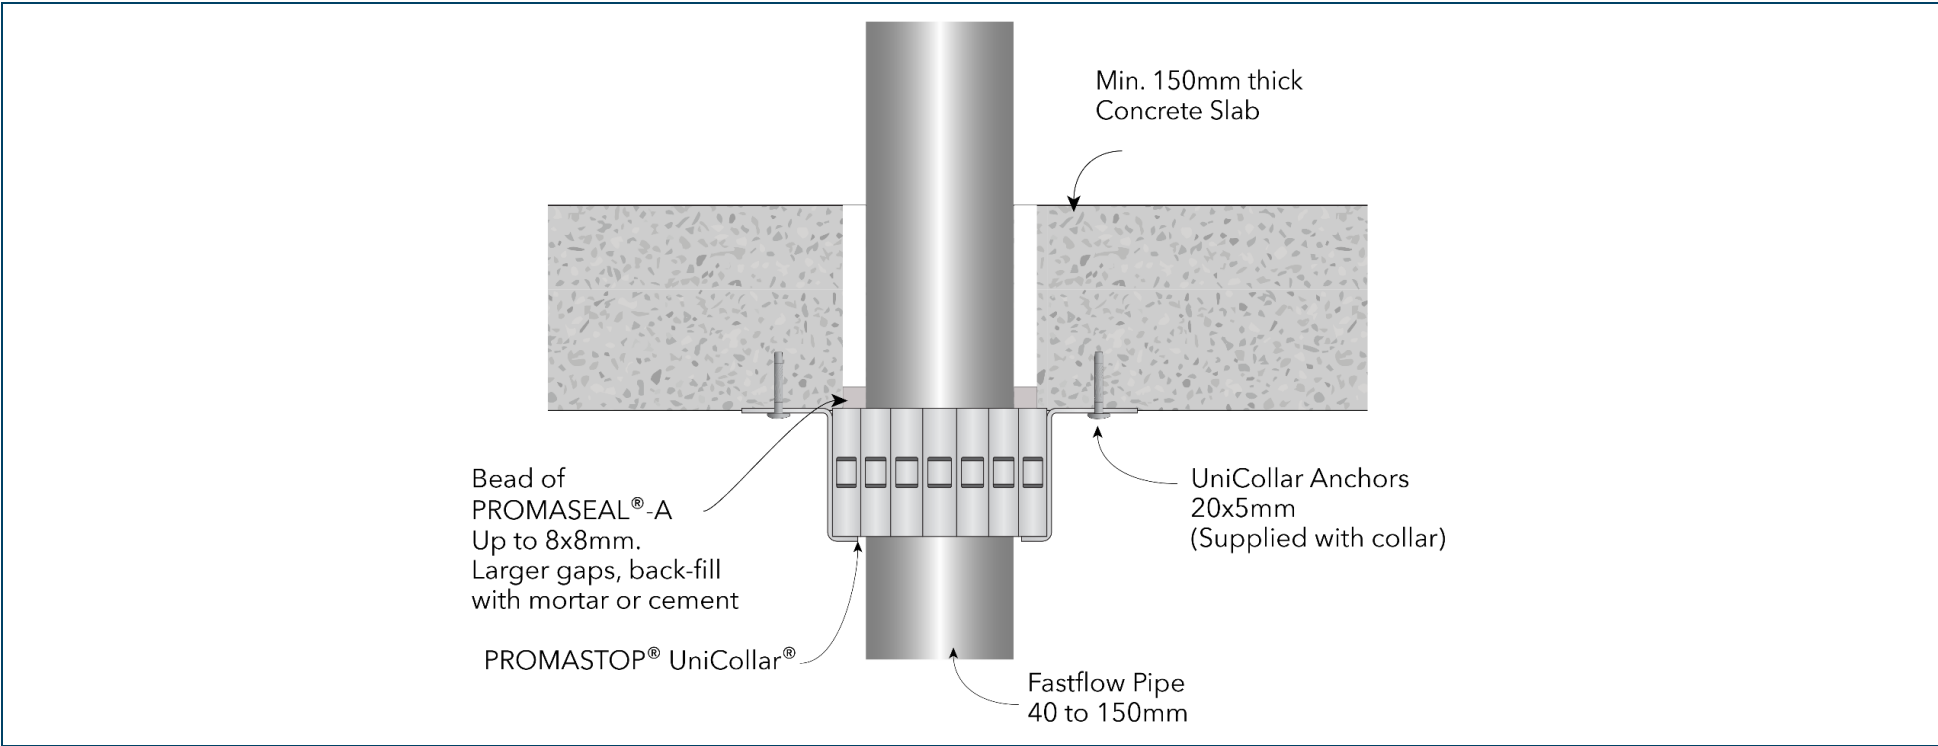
Cross section view of Fastflow pipe penetrating concrete slab protected by PROMASTOP® UniCollar® on the exposed side.
